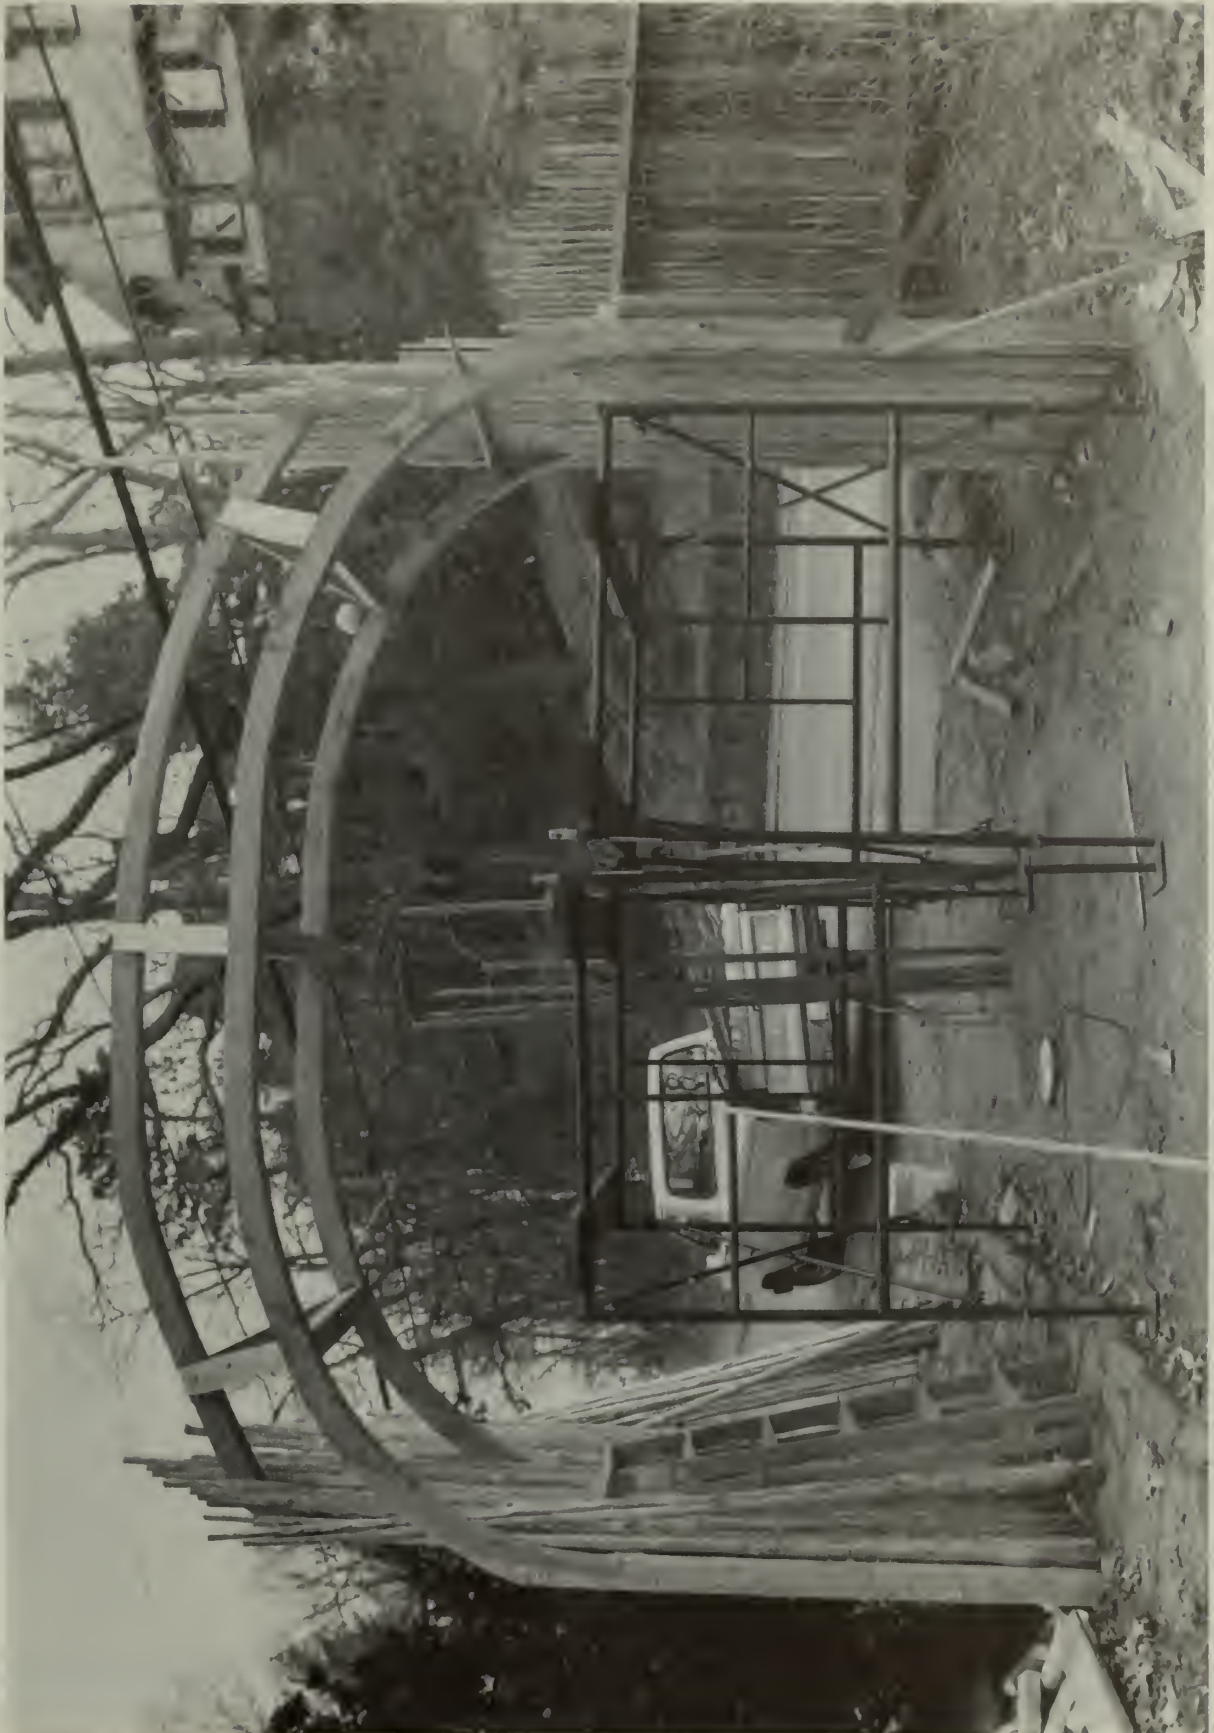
Spruce pole fence: reconstruction of the front driveway arch during the 1984 rebuilding.
